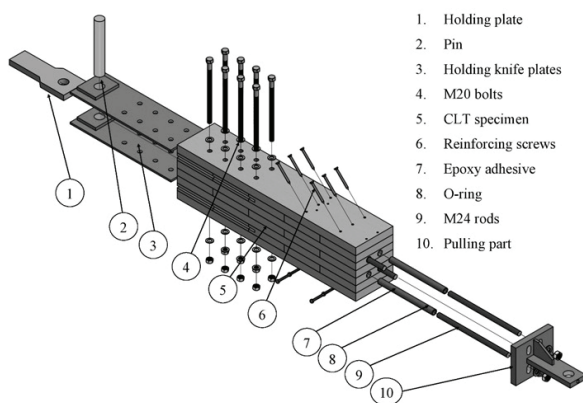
Exploded-view of CLT specimen containing rods with 250 mm embedment length in the parallel to the grain laminations.
